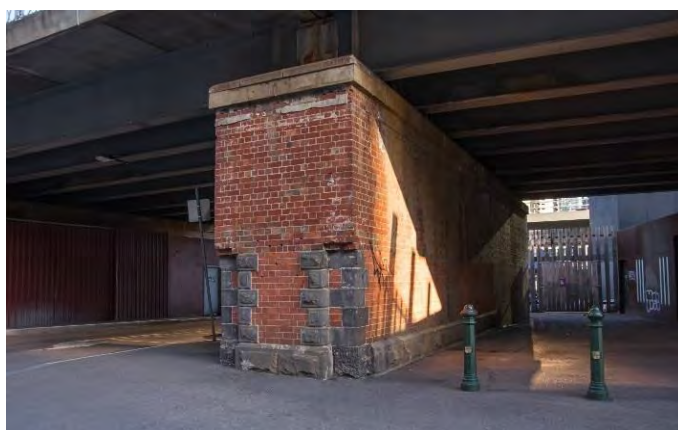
Bluestone foundation and quoining evident in one of the substructure. (Source: Context 2019)
